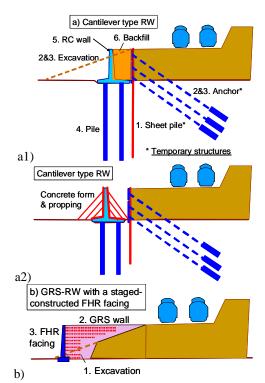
Reconstruction of a gentle slope of embankment to a vertical wall: a1) & a2) the traditional method; and b) the new method (the numbers indicate construction sequence).
